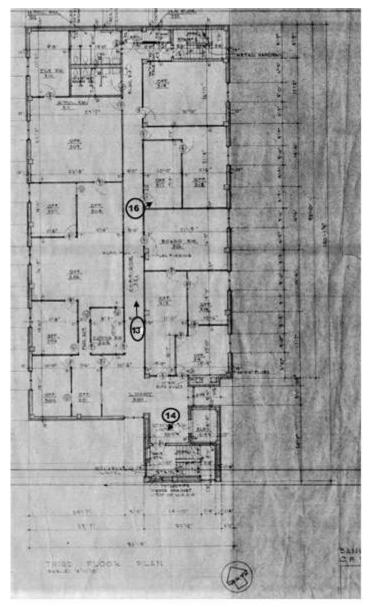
Floor Plan, Third Floor. Source: E.M. Harris Construction Company, St. Louis, MO
